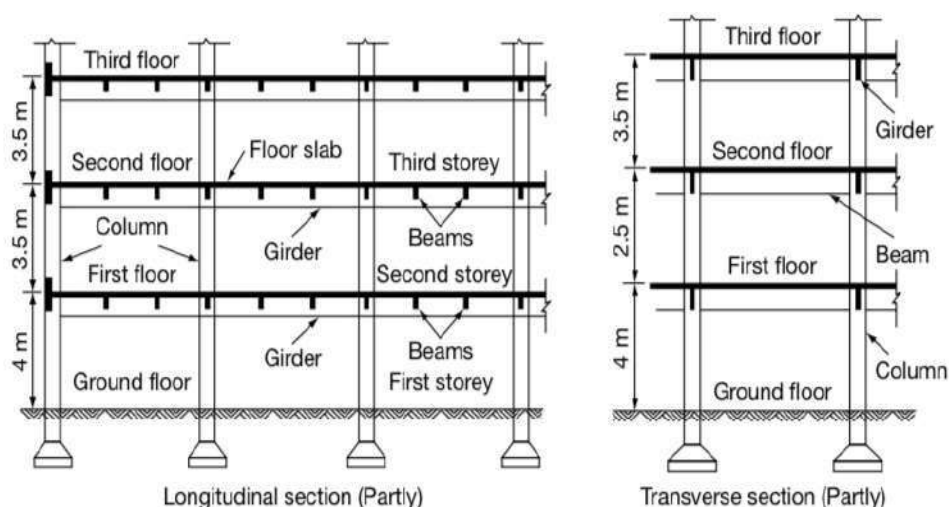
A typical frame of RCC multi-storeyed building.
